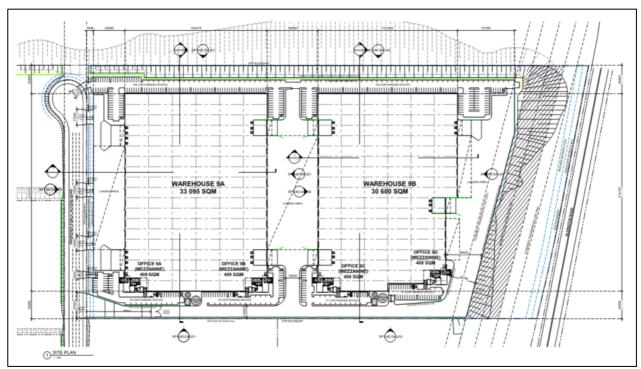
Proposed Lot 9 Site Plan (Source: Frasers 2021)
